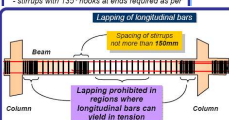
Details of lapping longitudinal reinforcement in seismic beams – as per IS13920-1993.
